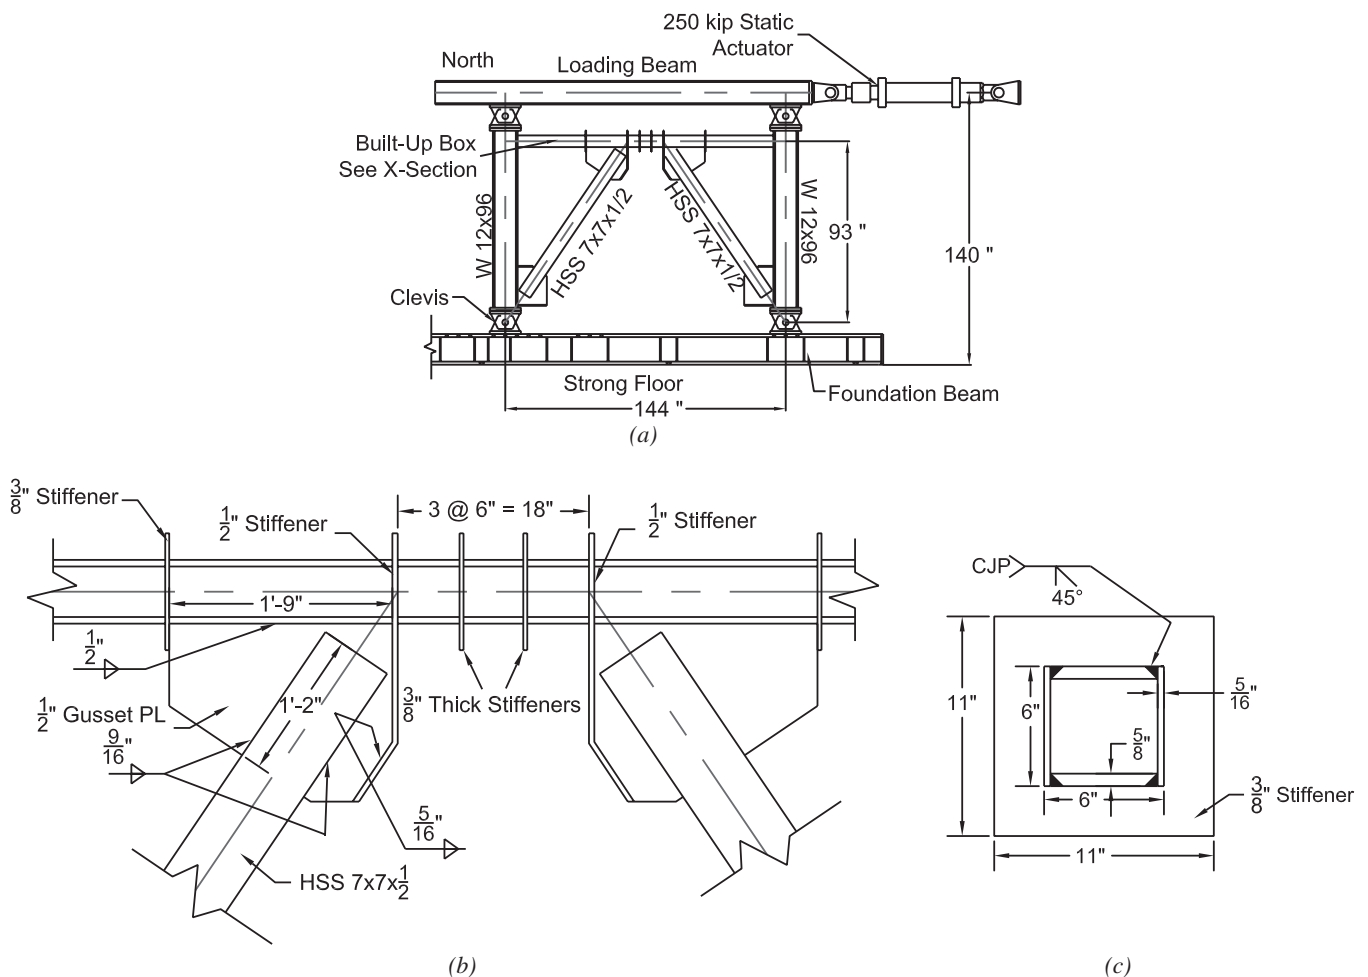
(a) Large-scale EBF with built-up box link test setup; (b) brace-to-beam connection and link details; (c) link cross-section at stiffeners (adapted from Berman and Bruneau, 2005).
